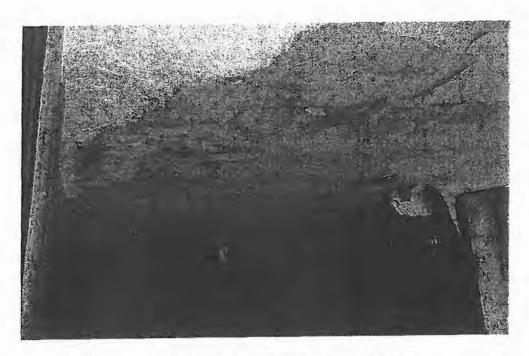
Plaster Damage and Sagging Second Floor Joists due to Water
